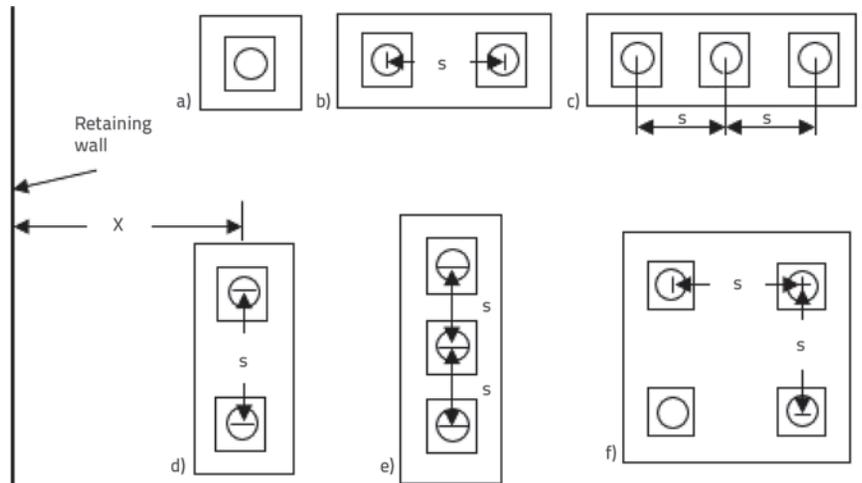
Pile group configurations considered in the study: a) Single pile; b) 1 × 2; c) 1 × 3; d) 2 × 1; e) 3 × 1; f) 2 × 2
